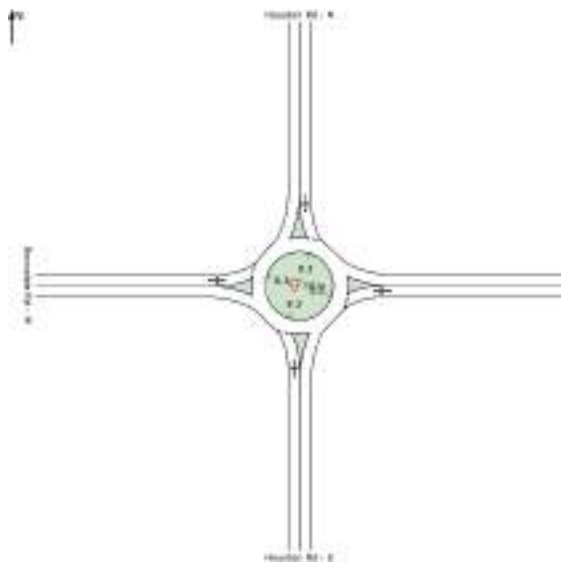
Proposed Houston Road/ Borrodale Road layout
